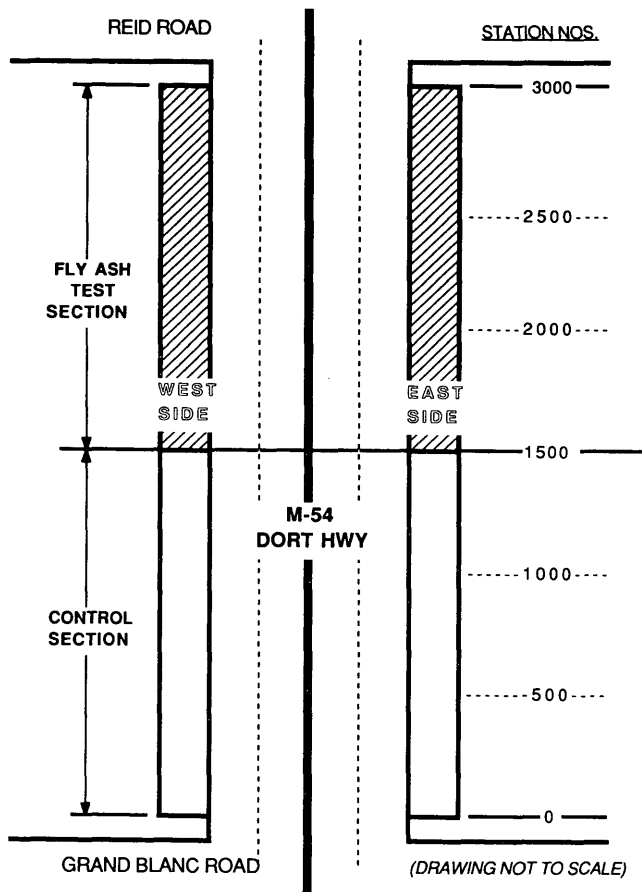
Schematic diagram showing plan and layout of road shoulder test.
